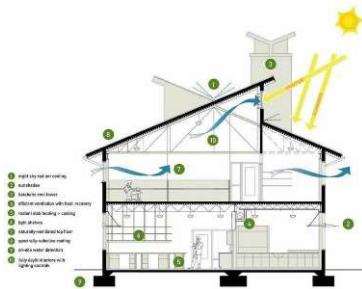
Longitudinal and cross section to illustrate Cross Ventilation
